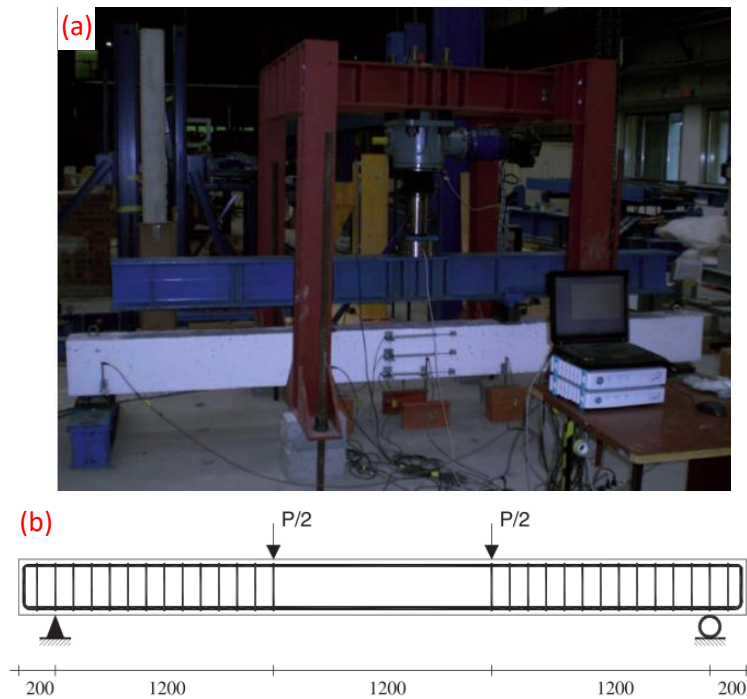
Overview of test setup (a), beam specimen, and reinforcement details with specimen geometry (b) (Meda and Plizzari, 2012)
